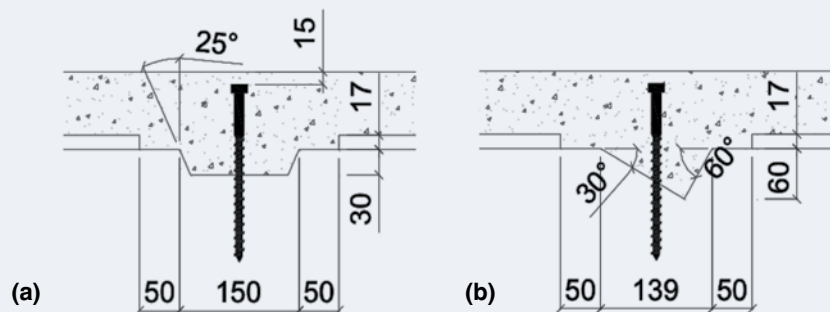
Notched connections – trapezoidal (a) and triangular (b).
